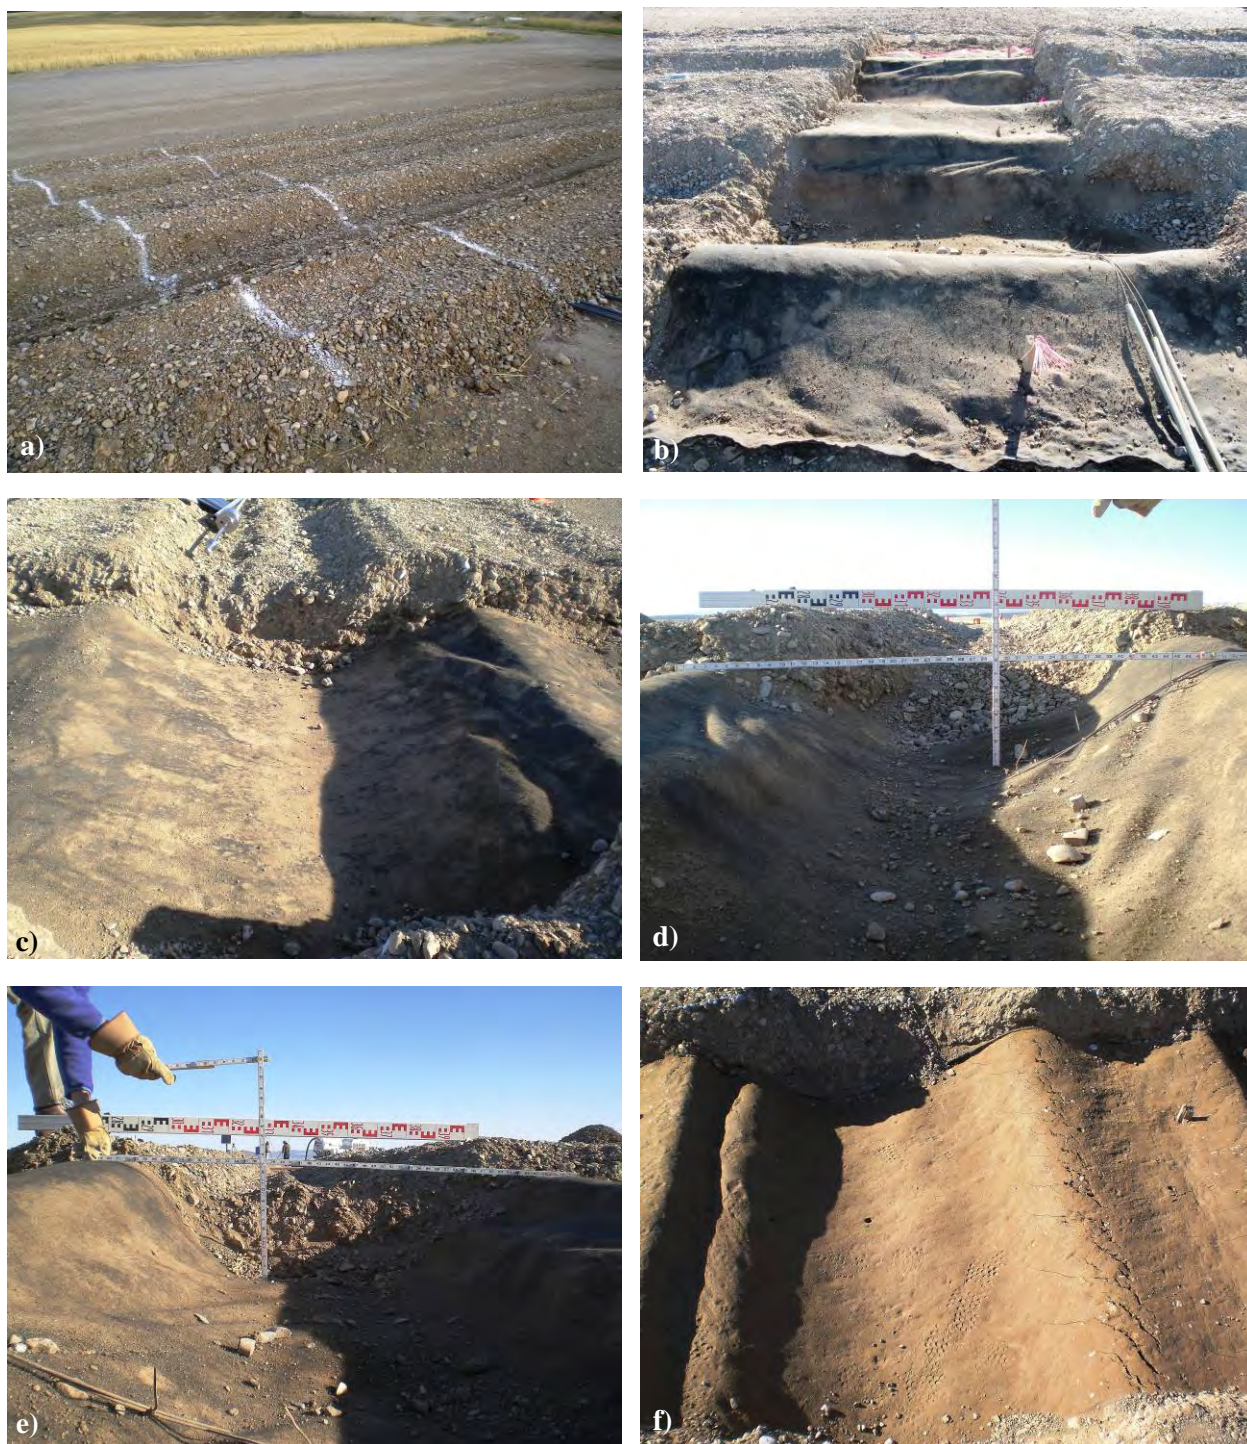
Photos of the forensic excavations of the NWoT-10 test section: a) excavation area, b) looking east, c) rut bowl, d) subgrade rut profile, e) subgrade rut profile and f) subgrade surface.
